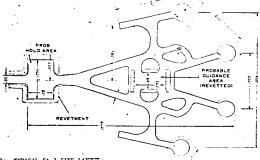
TYPICAL SA-3 SITE LAYOUT
